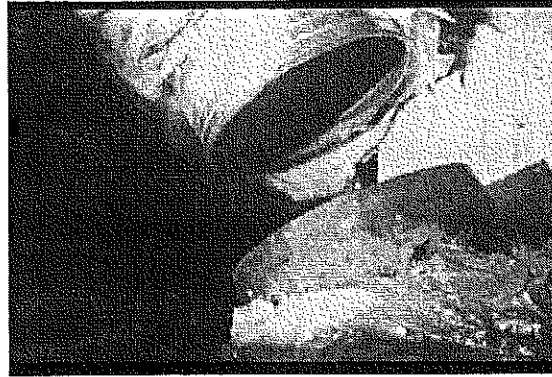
Point of Failure Showing Elbow Detached from Vertical Rainwater Leader
